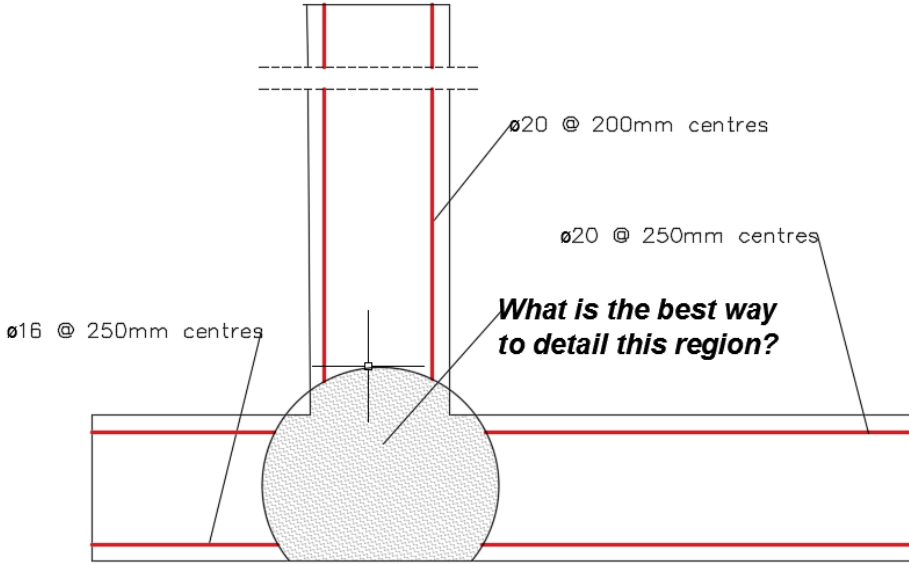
Reinforcing bars in wall and base slab (excluding the connection).
